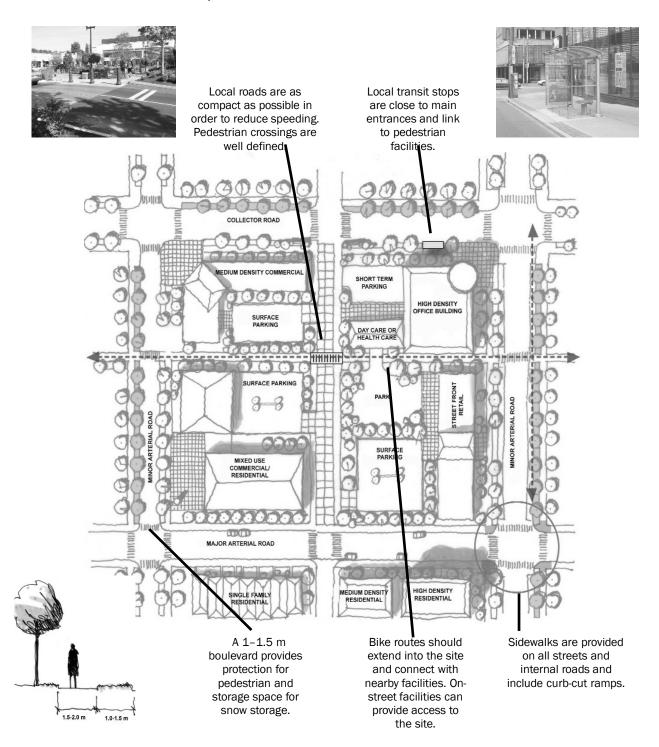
Application of Site Infrastructure Elements on a Typical Site
